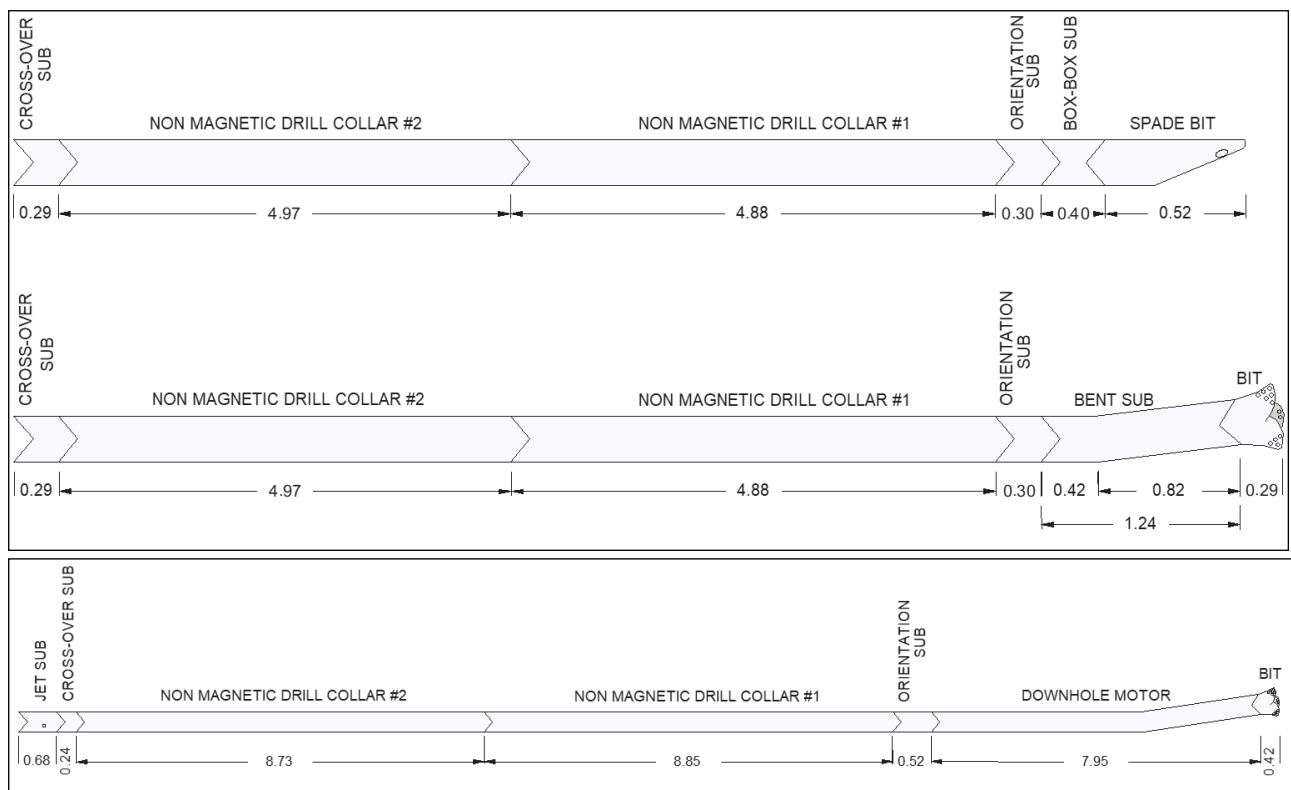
Example drilling assemblies; Jetting assembly with spade bit at top, jetting assembly with tri-cone bit in centre, and downhole motor assembly with tri-cone bit at bottom.
